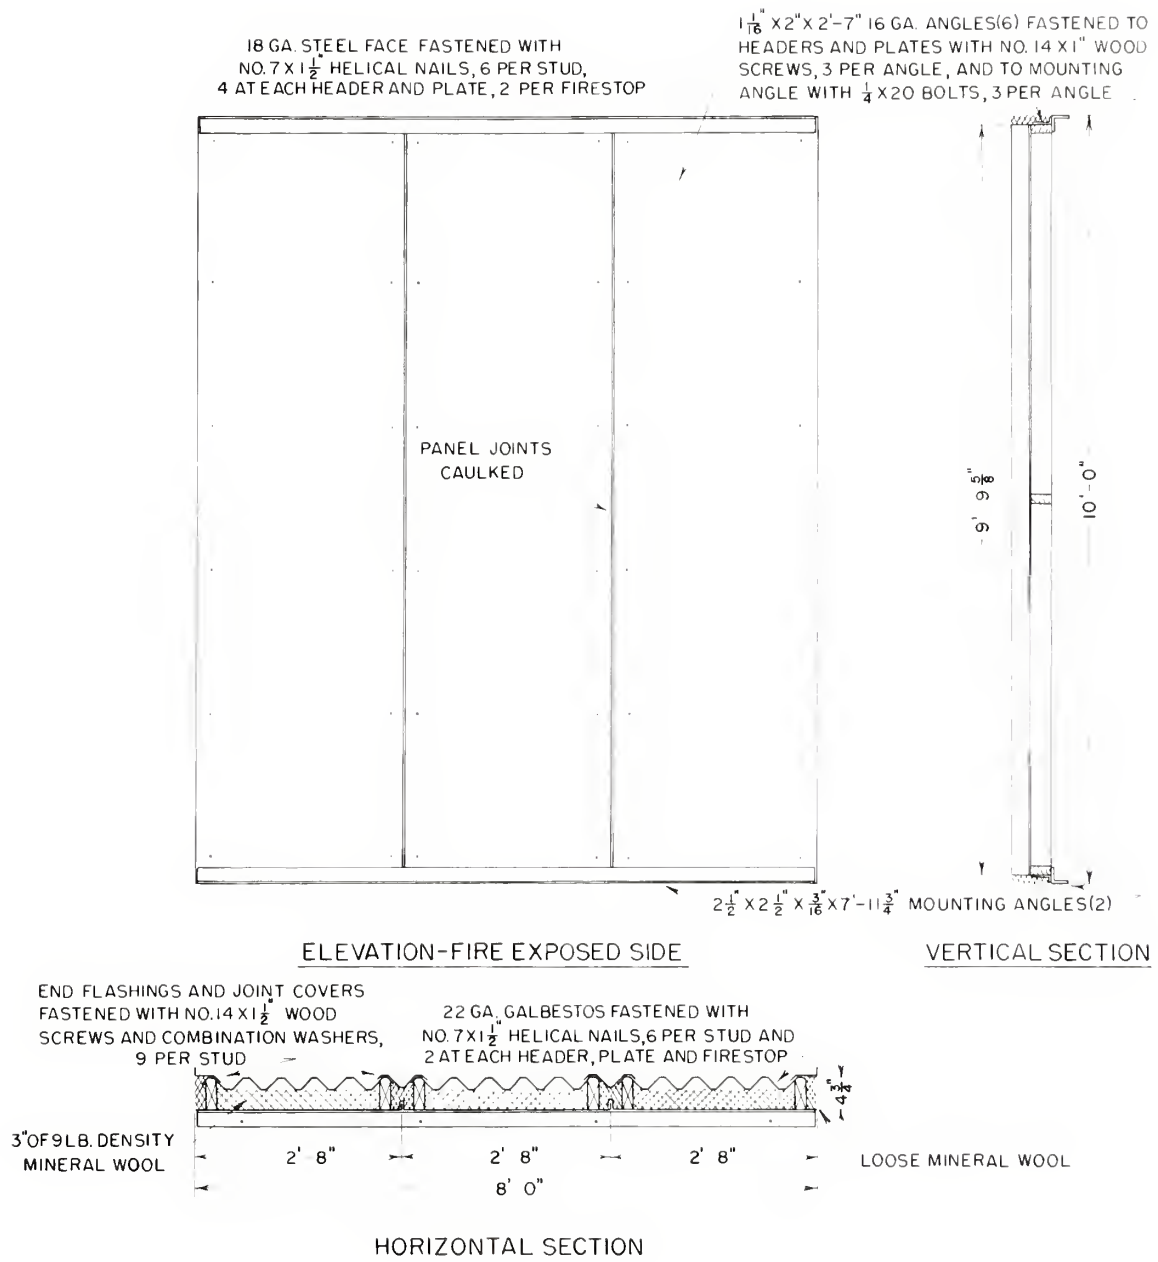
CONSTRUCTION DETAILS OF TEST PANEL NO.3
